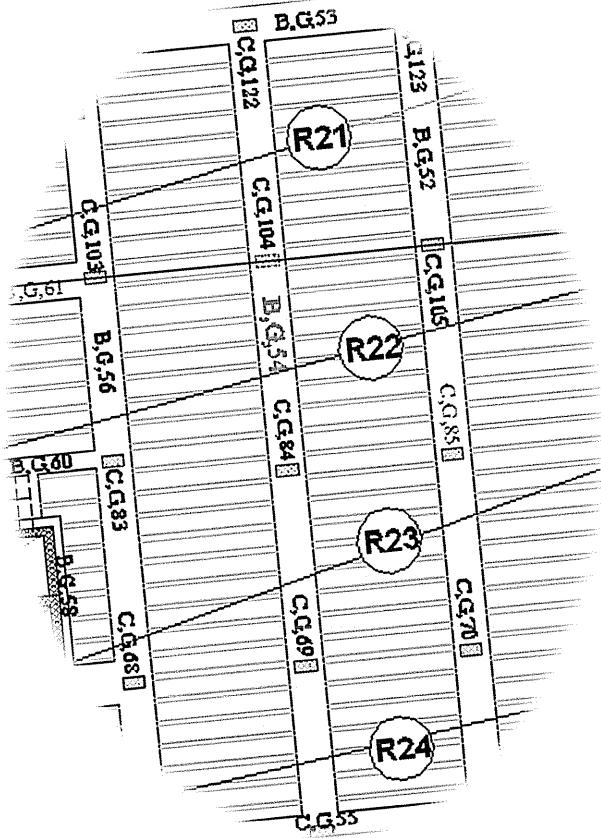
Top reinforcement in Y-dir. Basement floor.
